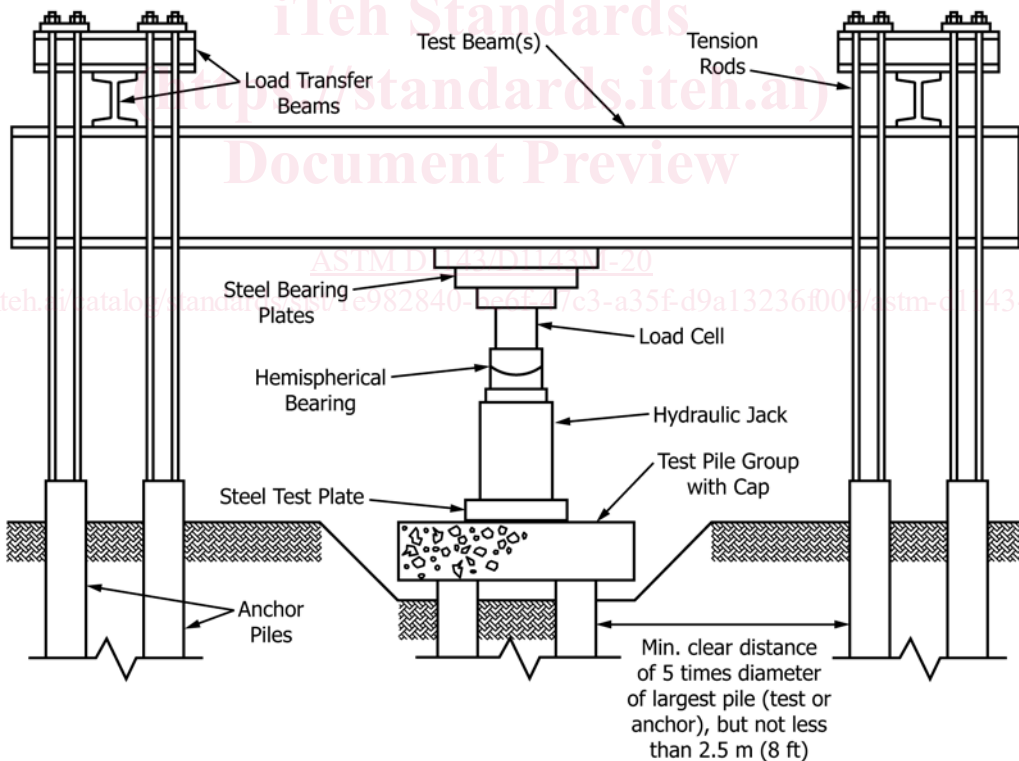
Schematic of Hydraulic Jack on an Element Group Acting against Anchored Reaction Frame
